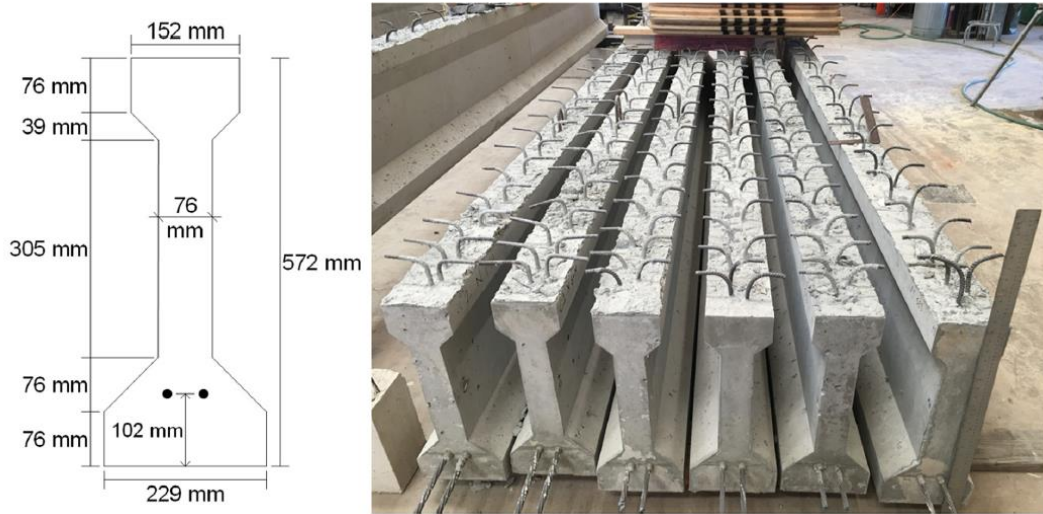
Scale girder dimensions (left) and completed sections (right) [30]
